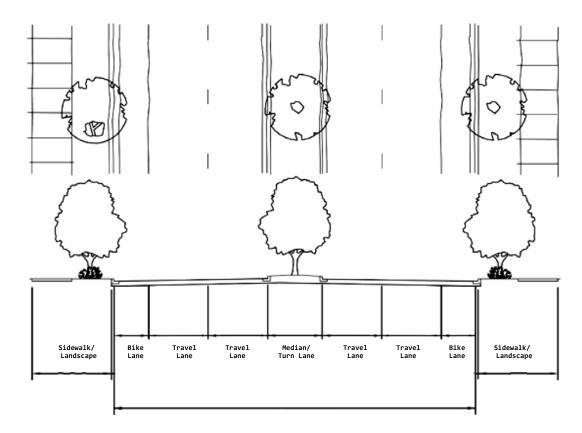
CONCEPTUAL MAIN STREET CROSS-SECTIONS
